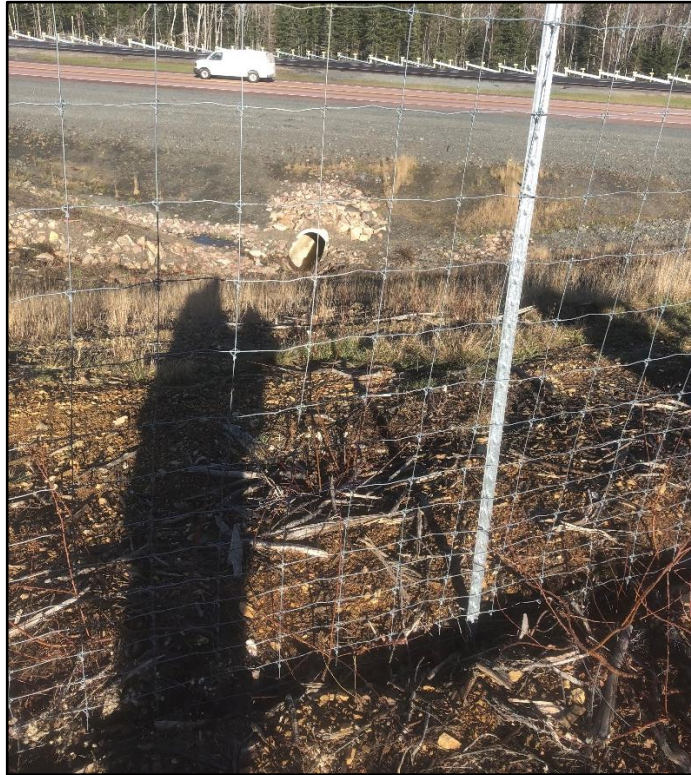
When fencing is not installed between the head of a culvert and the highway, as has occurred in this case, small/medium mammals can not access the culvert entrance as means of crossing under the highway.
